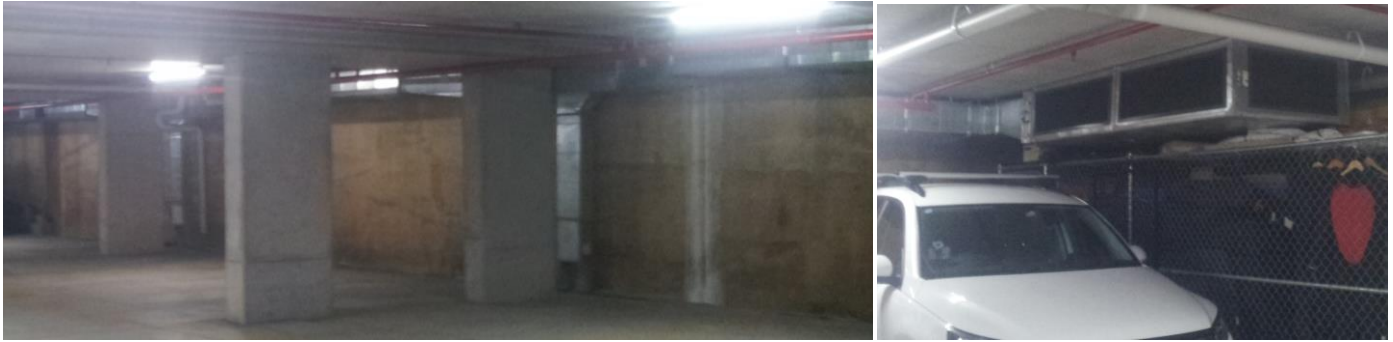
From left to right, Ductwork running along north wall, Lower level ductwork beneath ventilation room
